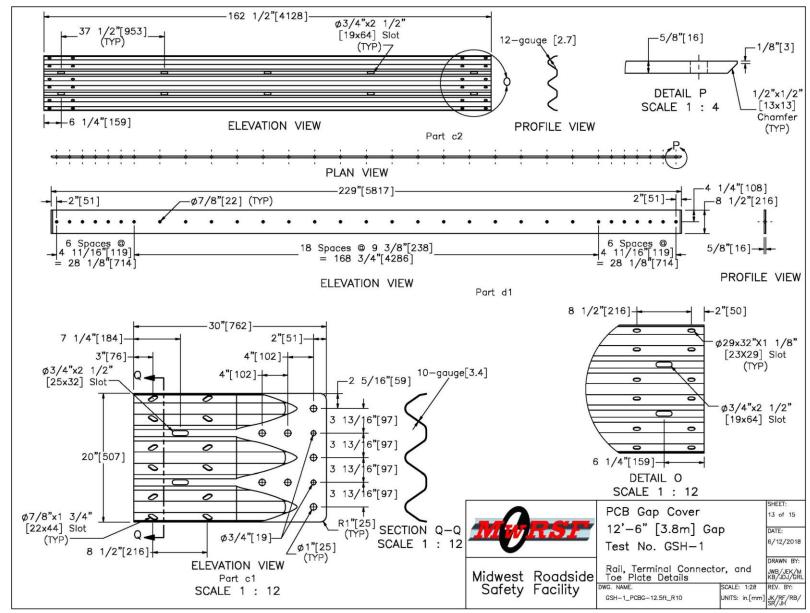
Rail, Terminal Connector, and Toe Plate Details, Test No. GSH-1
